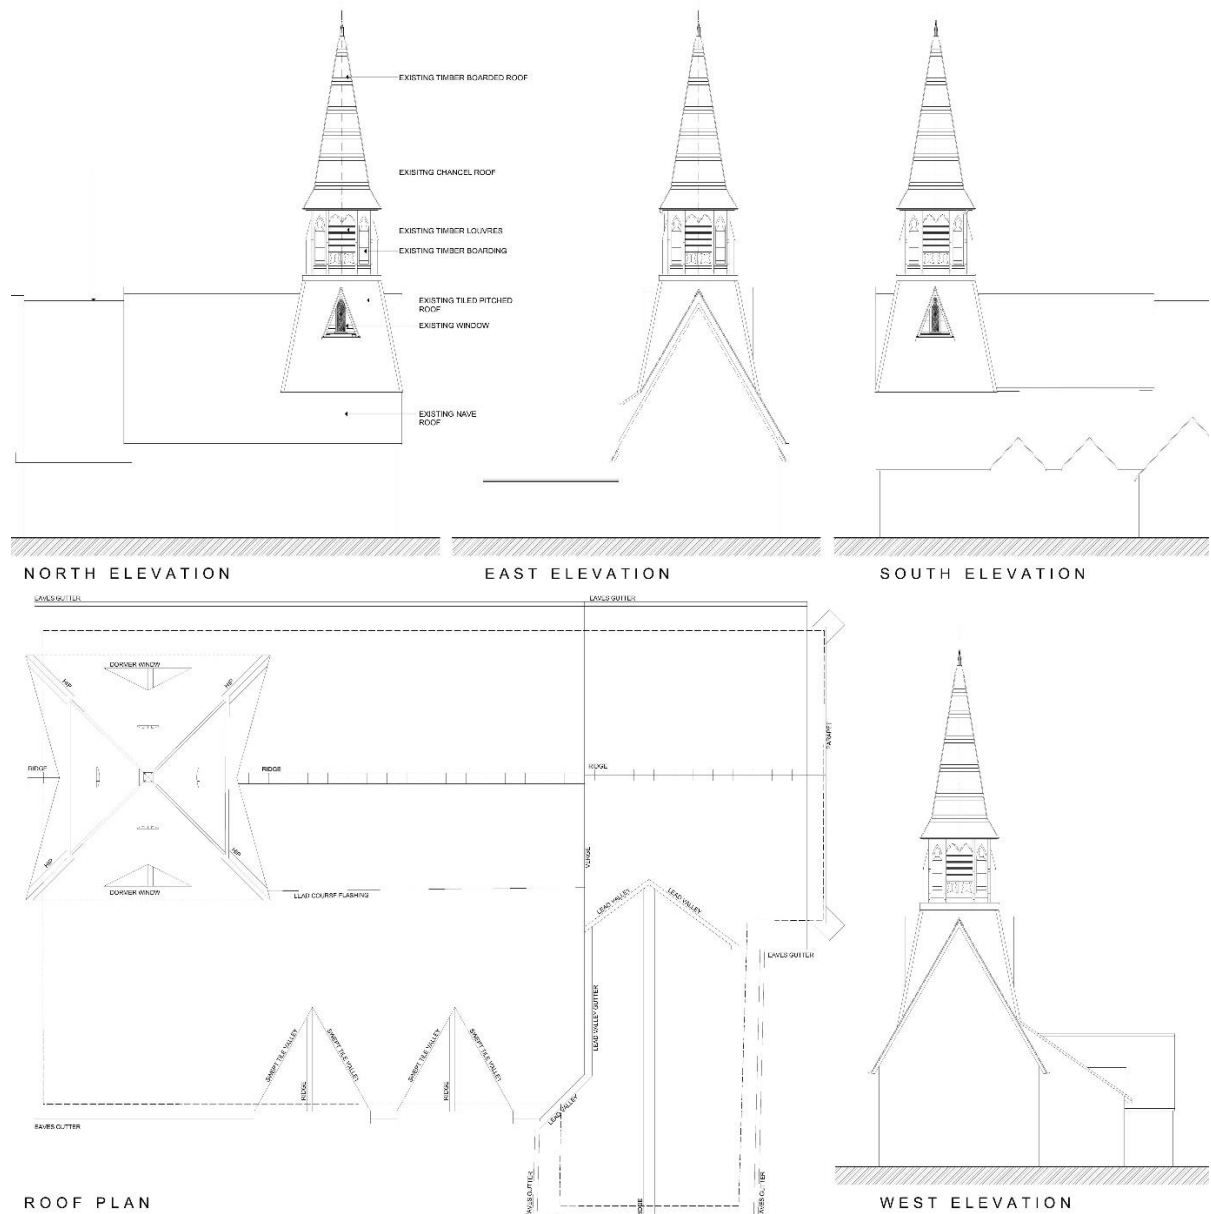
Extract from application drawing showing the general arrangement of the existing church roofs (NTS).
